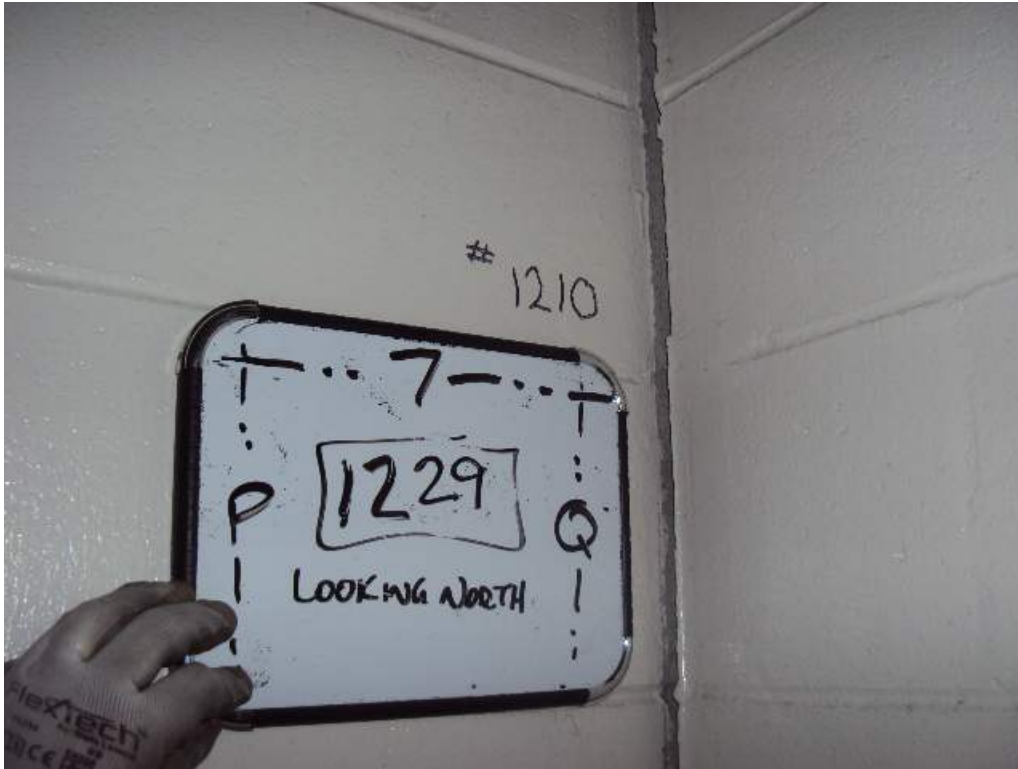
1st Floor – Room 1229– Along col line 7 between col lines P and Q– Looking North–Vertical cracks at CMU wall corner with CMU wall displacement
